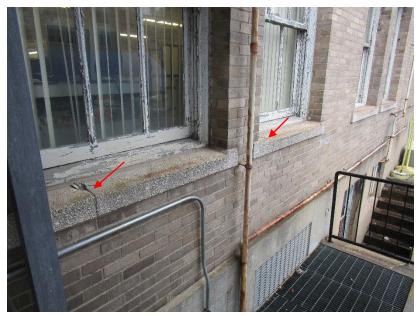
Cracks at cast stone window sills. Also note peeling paint at windows. This paint failure is typical at all windows.
